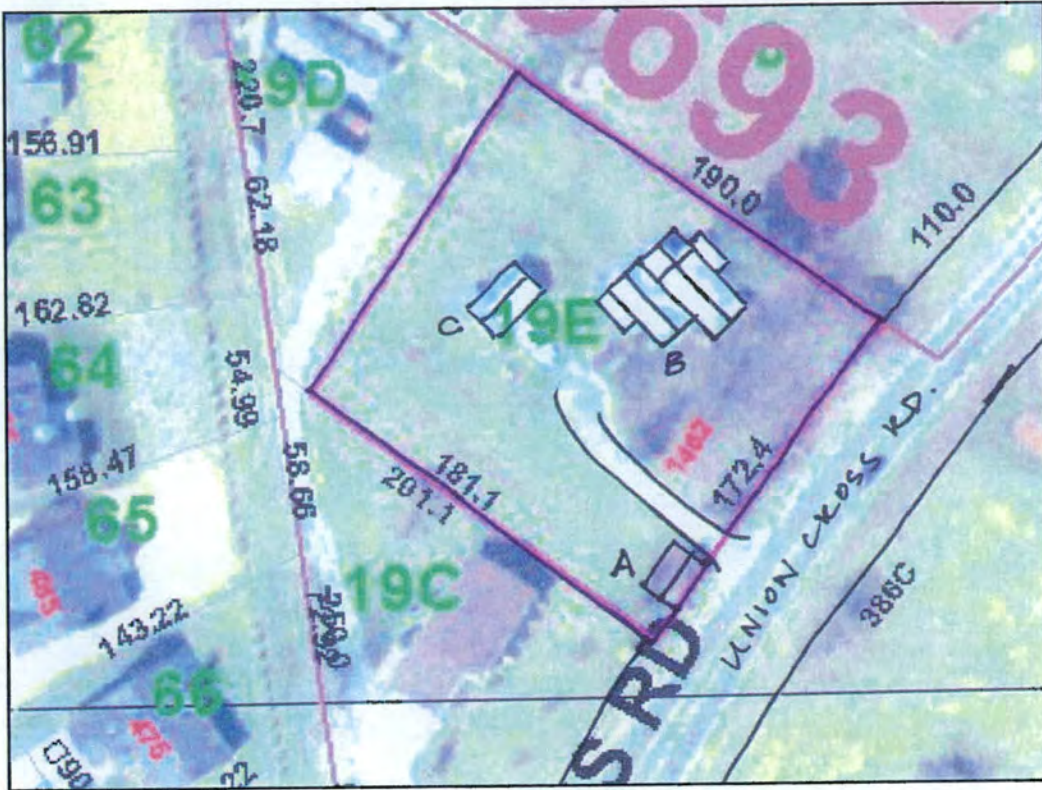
Well house site plan, not to scale. Well house (A), bungalow (B), storage building (C).
